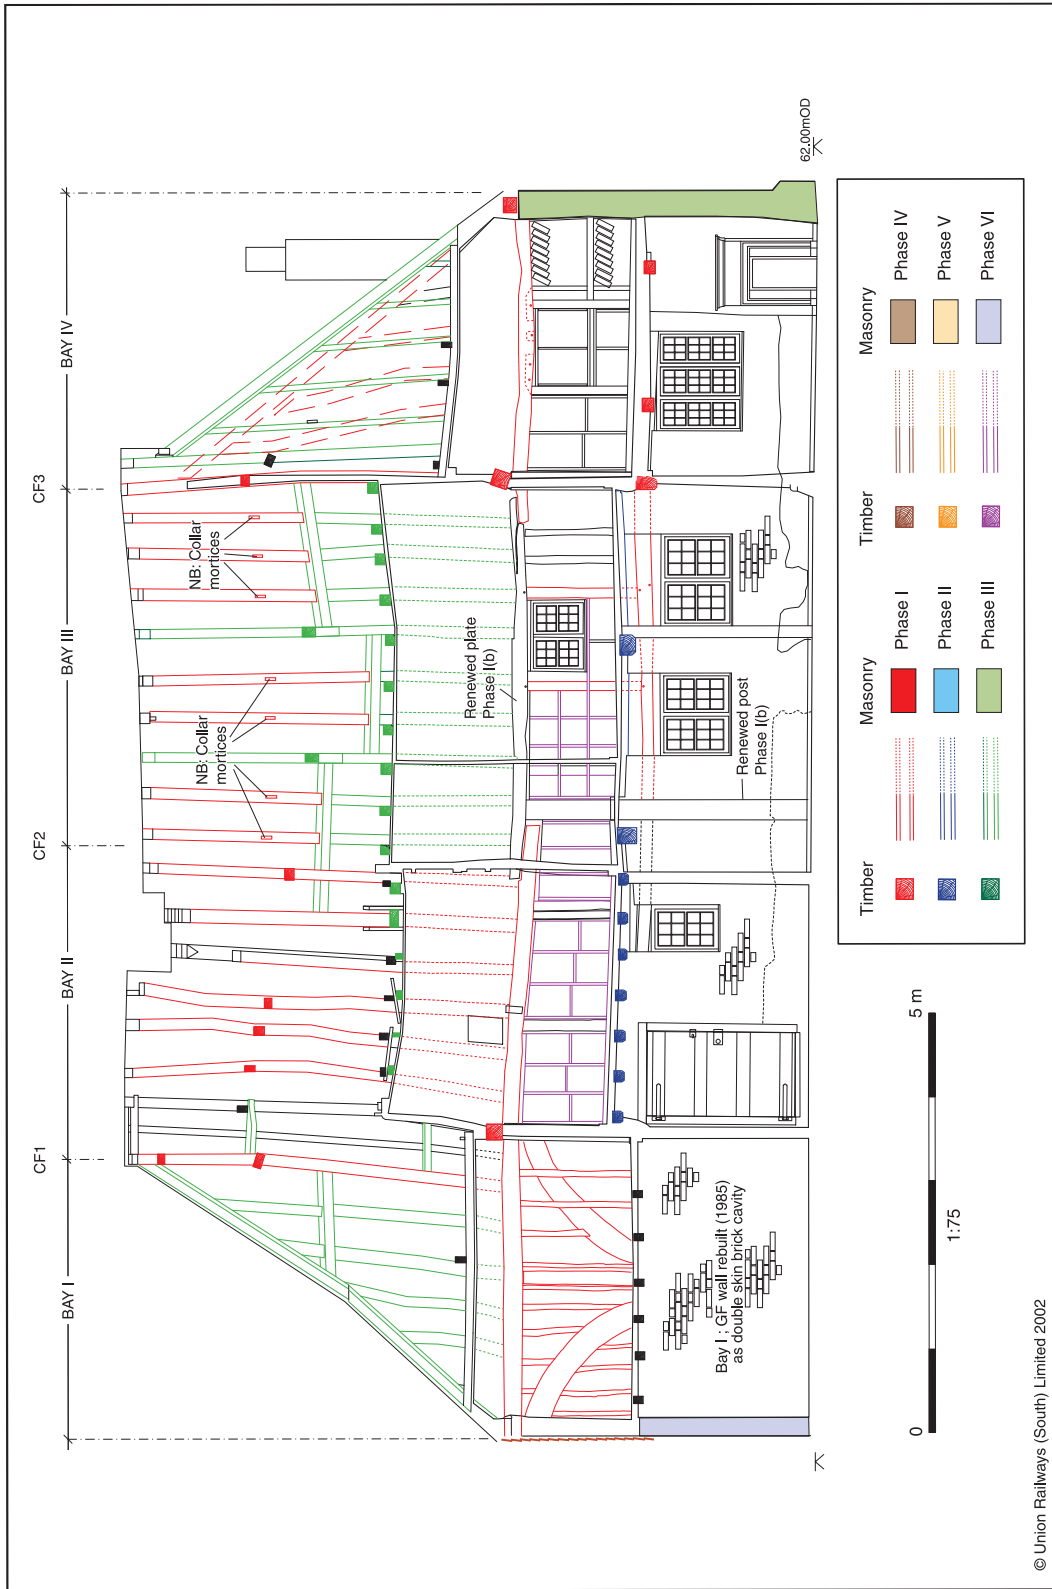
Talbot House: interior longitudinal elevation looking south, with phasing of principal structural elements
